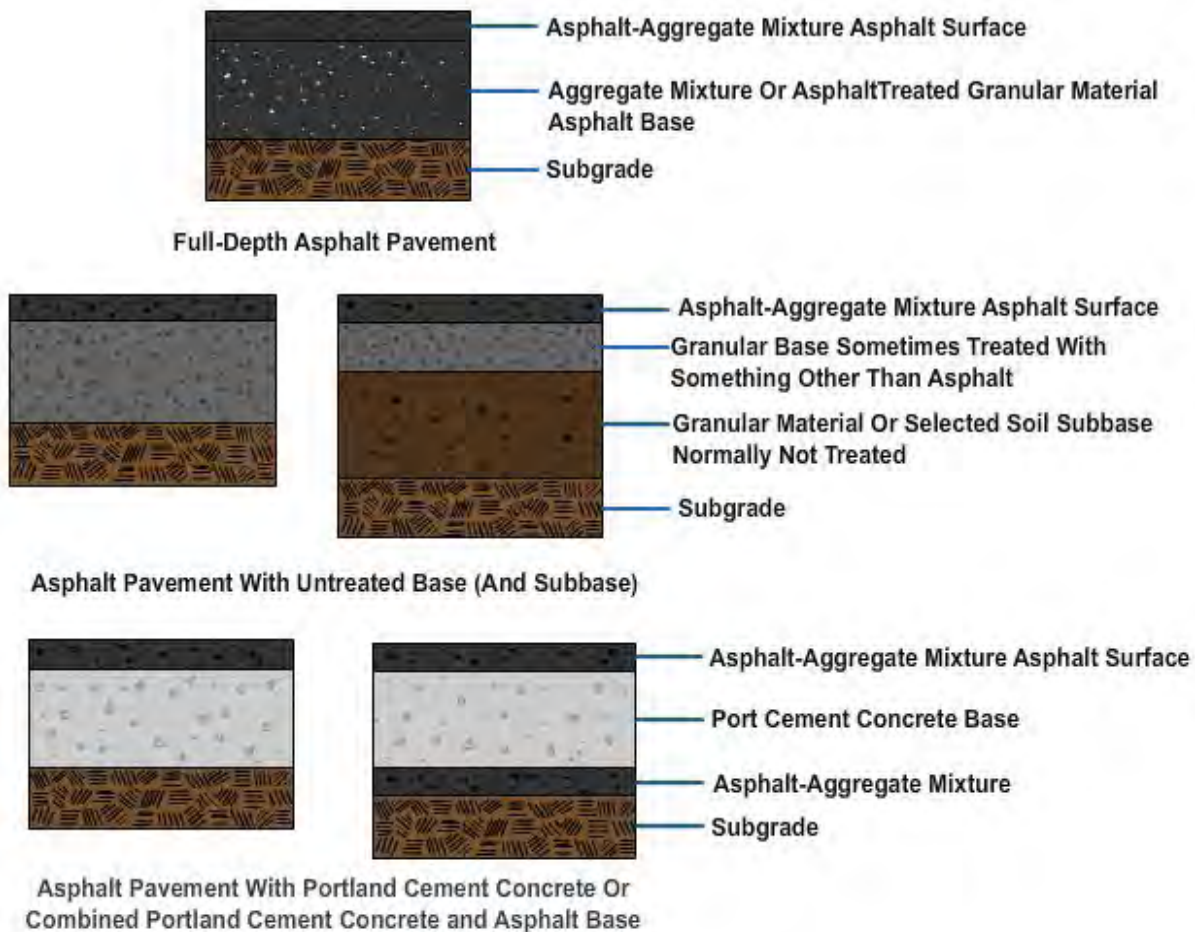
Asphalt pavement cross sections, showing common and typical asphalt pavement structures.
